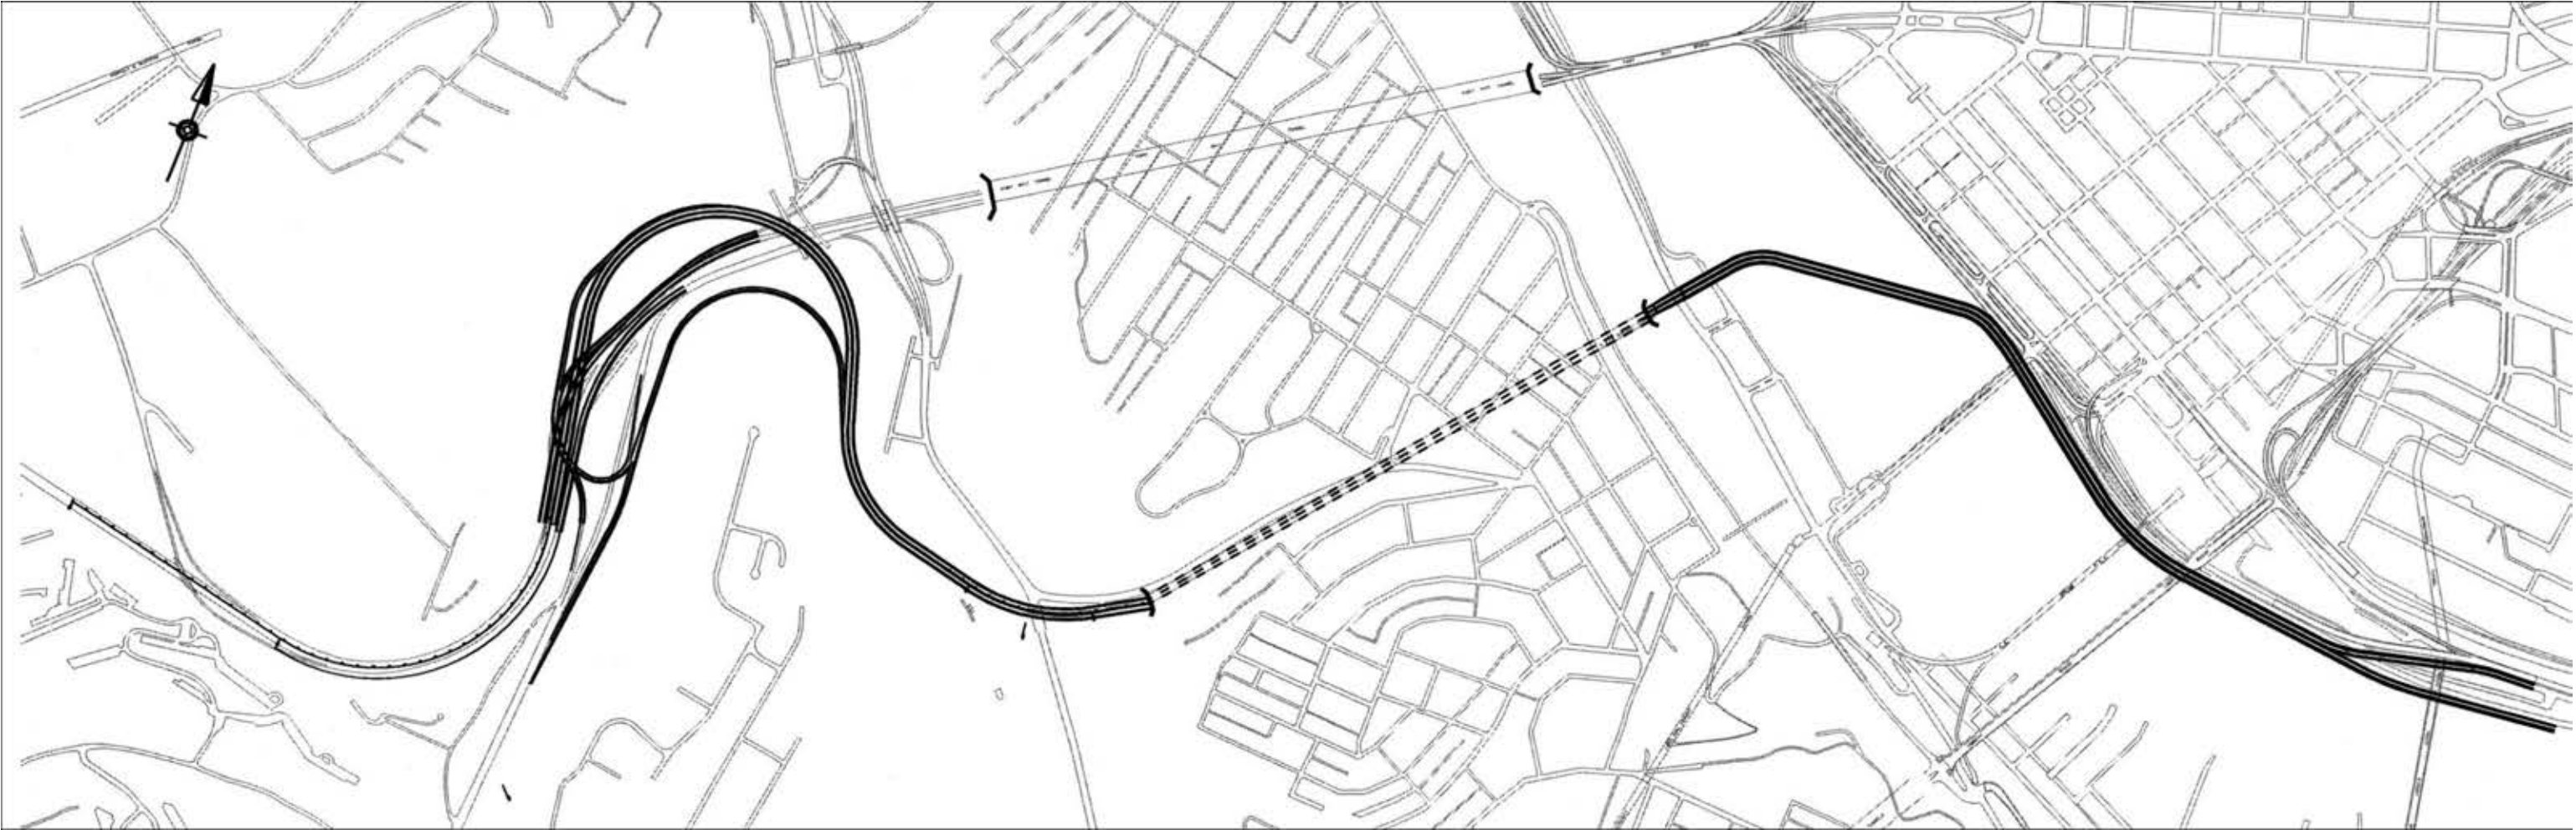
Citizen's Alternative - Inbound to Pittsburgh via the Parkway West and Expanded Wabash Tunnel to Parkway East Segment
